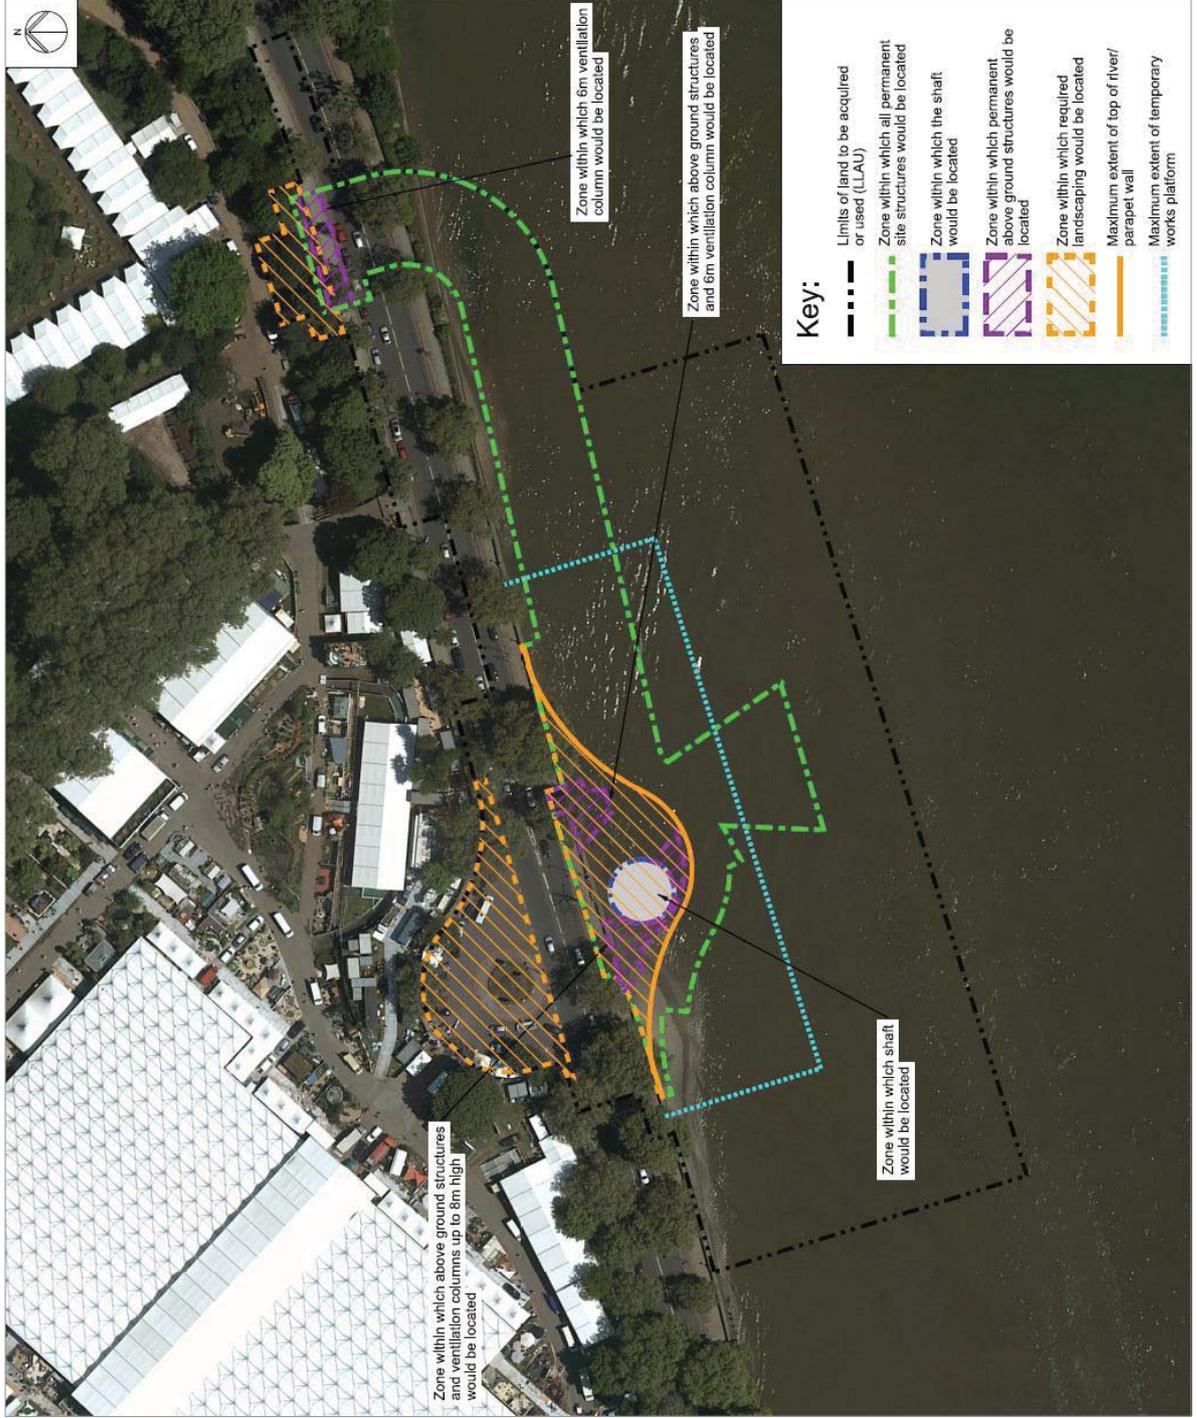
Schematic layout at the Chelsea Embankment Foreshore site
